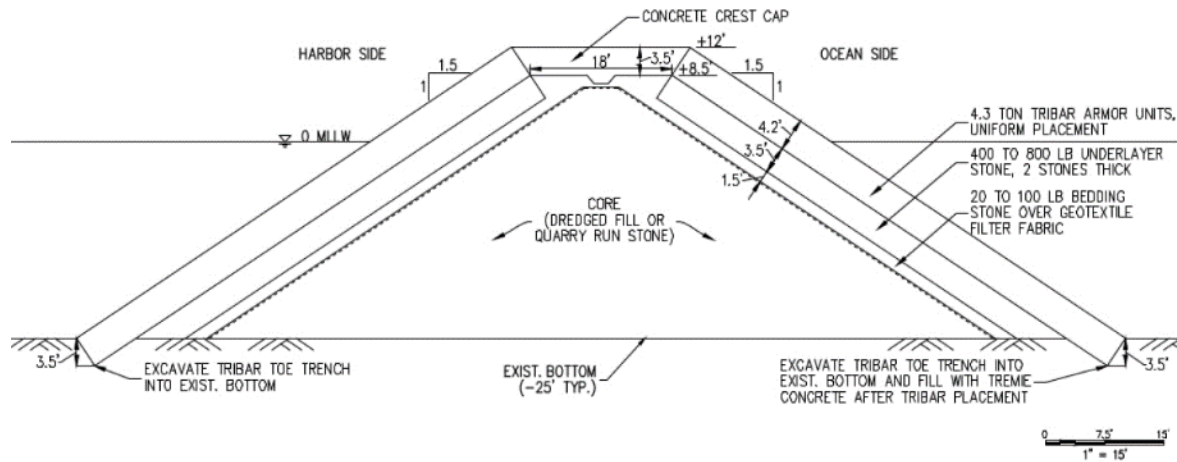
Typical Cross-section of Alternative 2: Breakwater Extension (Sea Engineering, 2015)
